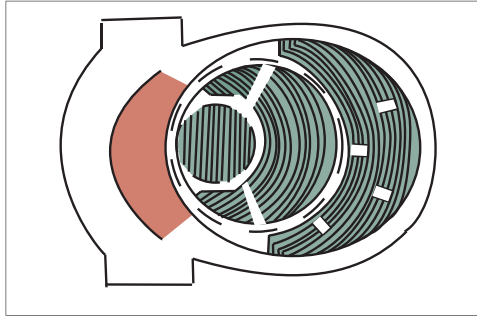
Stage and seating layout option 1. A traditional layout with the stage at the front
